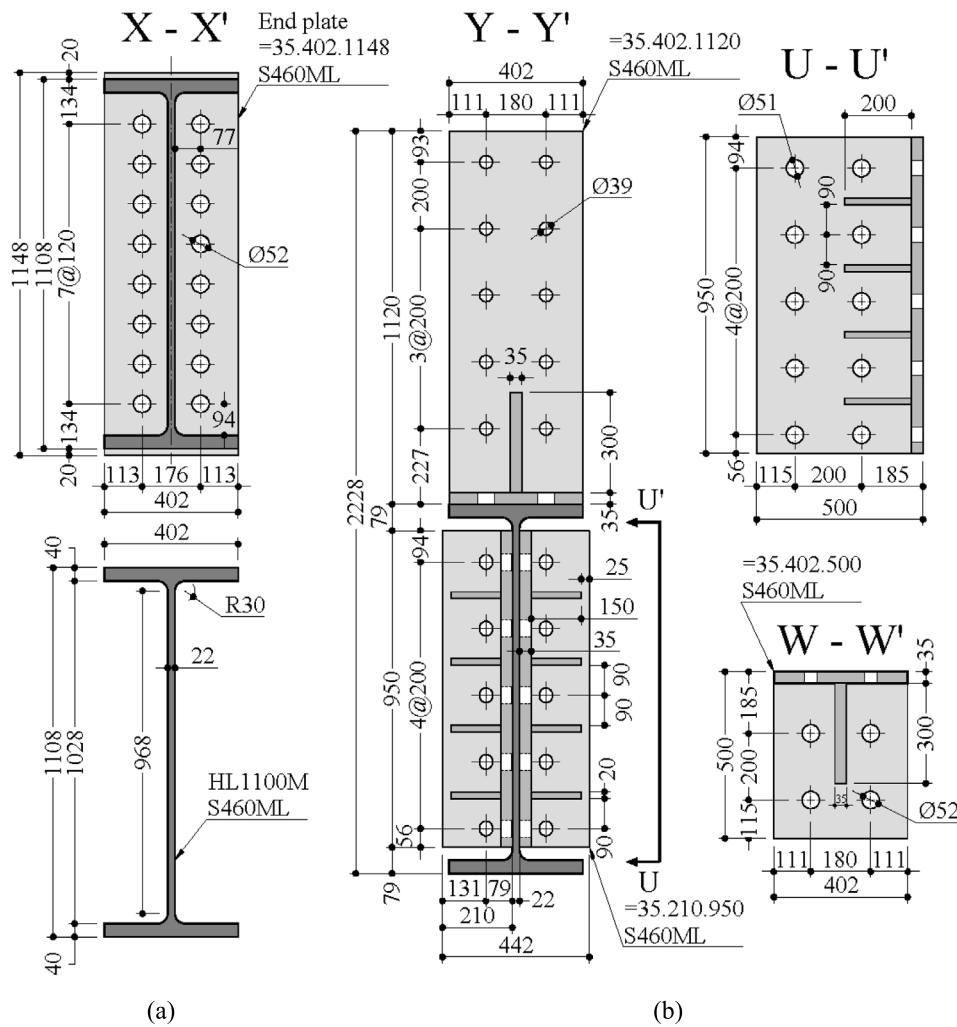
Details of specimen: (a) beam-column connection; (b) attachment to reaction wall.
